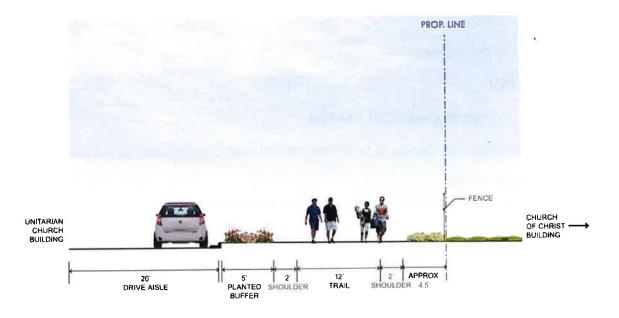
Option 2 – Full Build-Out South Typical Section
